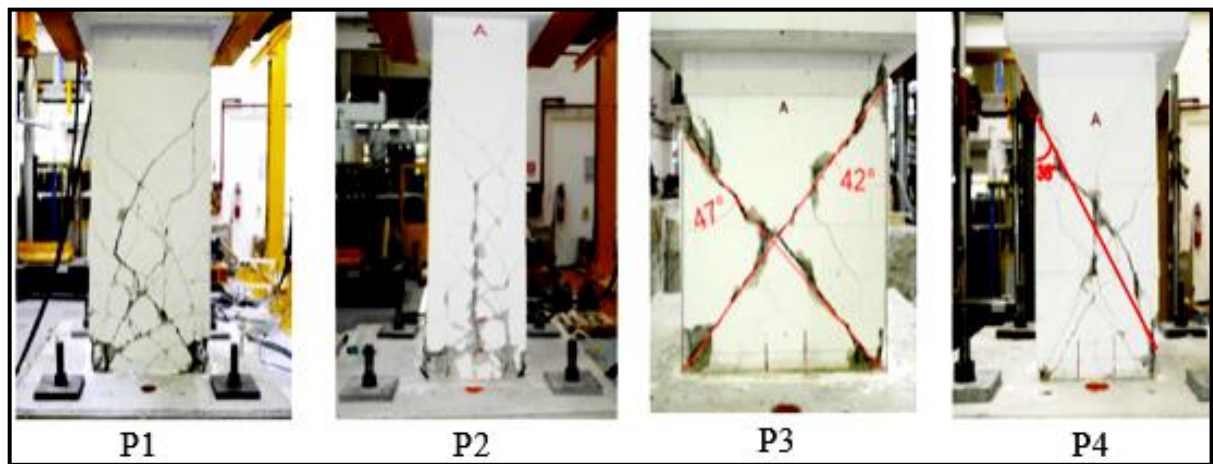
Final Damage State of Specimens Depicting Mode of Failure (Cassese et al.,2017)
